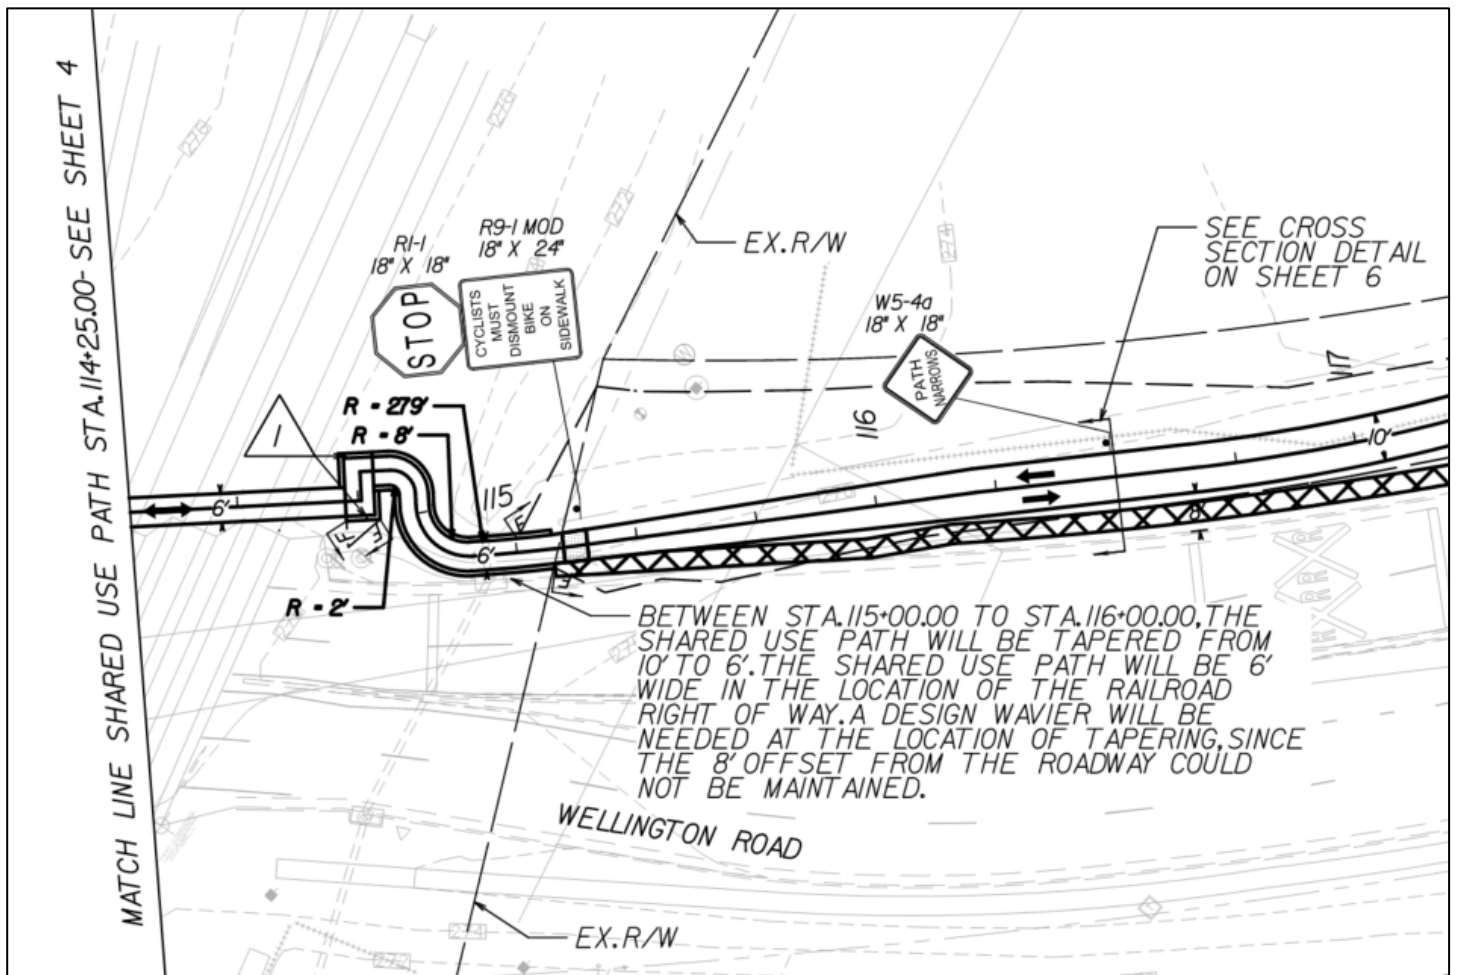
Proposed Crossing Infrastructure (Z-Gate and Six-Foot Wide Sidewalk) within Norfolk-Southern Right-of-Way
